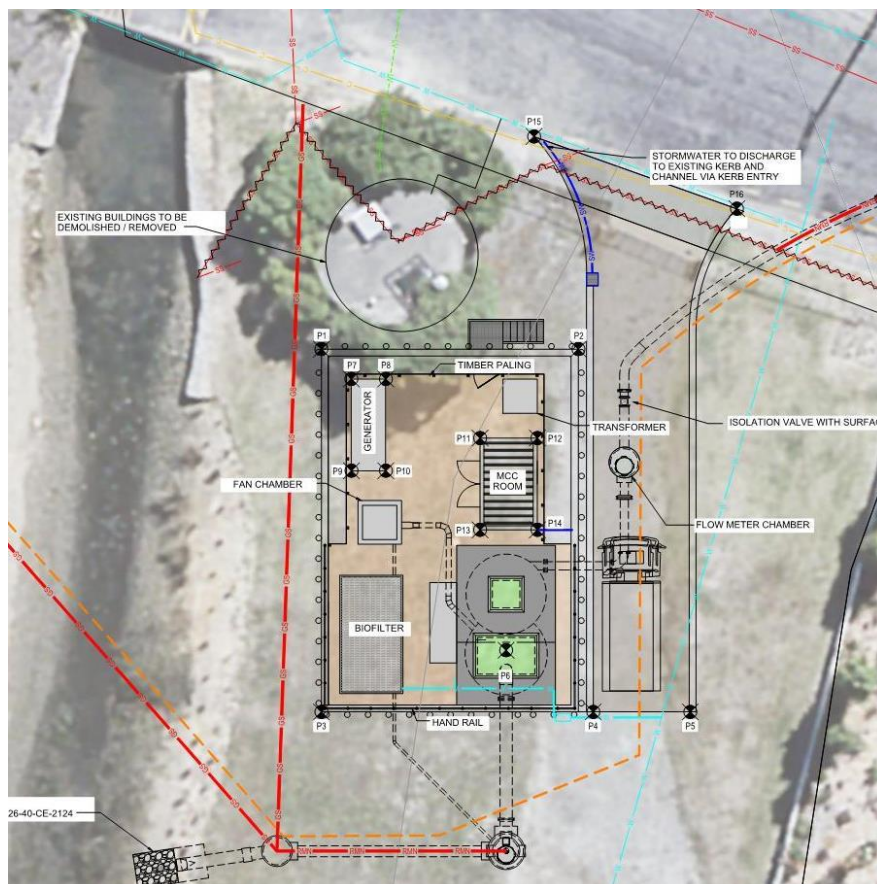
Surrey Street Pump Station site plan layout at detailed design stage
